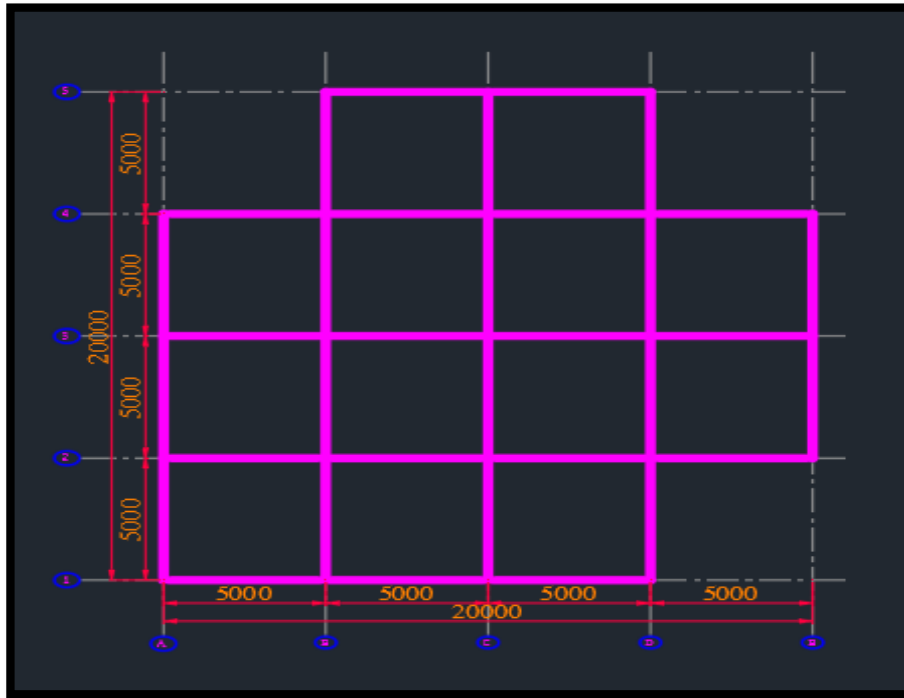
Column Beam Layout for Analysis for Plan A with A1, A2, A3, A4 Models
